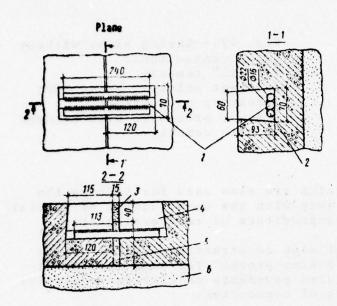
Connection of the slabs by welding the working reinforcement outlets:
